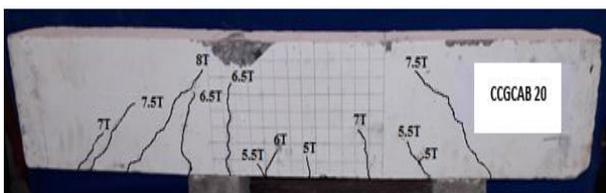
Failure Pattern of RWGCA Concrete Beam M 20 (CCGCAB)
